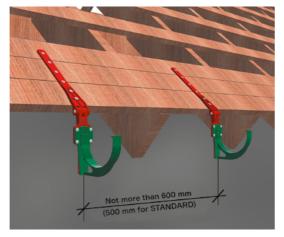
Positioning PVC brackets with adjustable fastening elements on the sheathing
